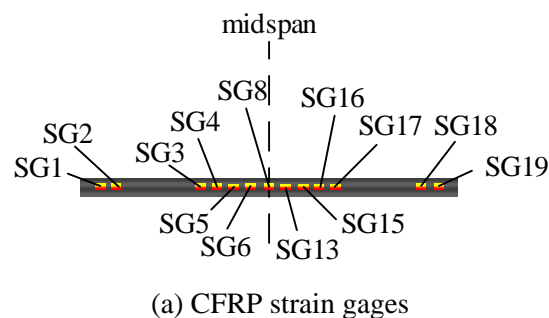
Instrumentation on FRP-strengthened steel beams (all dimensions in mm).
